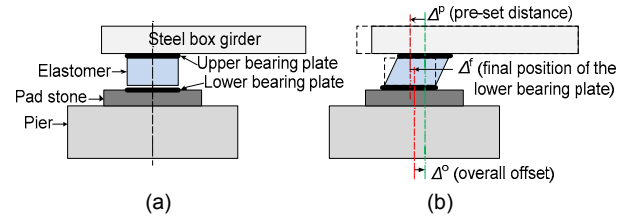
Pre-setting distances for a sliding bearing: (a) design state of bearing; (b) pre-setting distance for bearing
